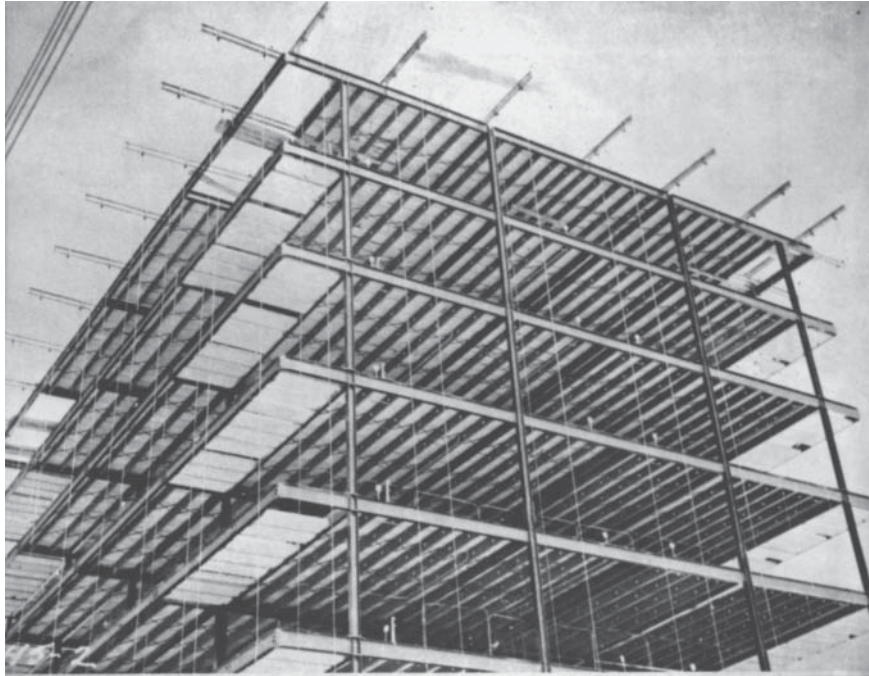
Cold-formed steel joists used together with hot-rolled shapes. Courtesy of Stran-Steel Corporation.
